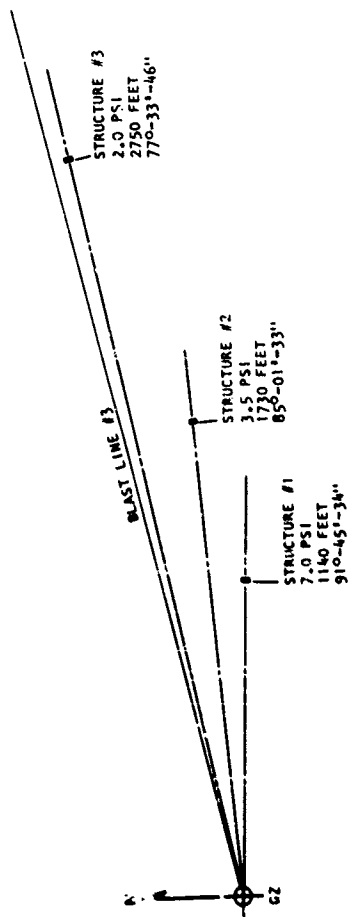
LOCATION OF SRI TEST STRUCTURES
